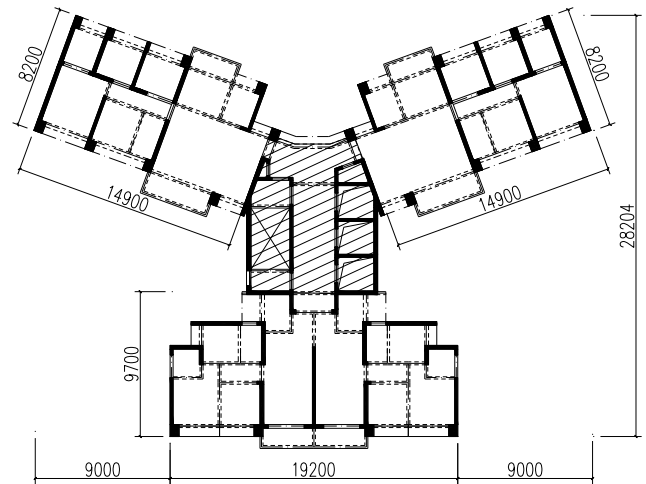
Standard floor plane of a super high-rise residential building in Shenzhen.
